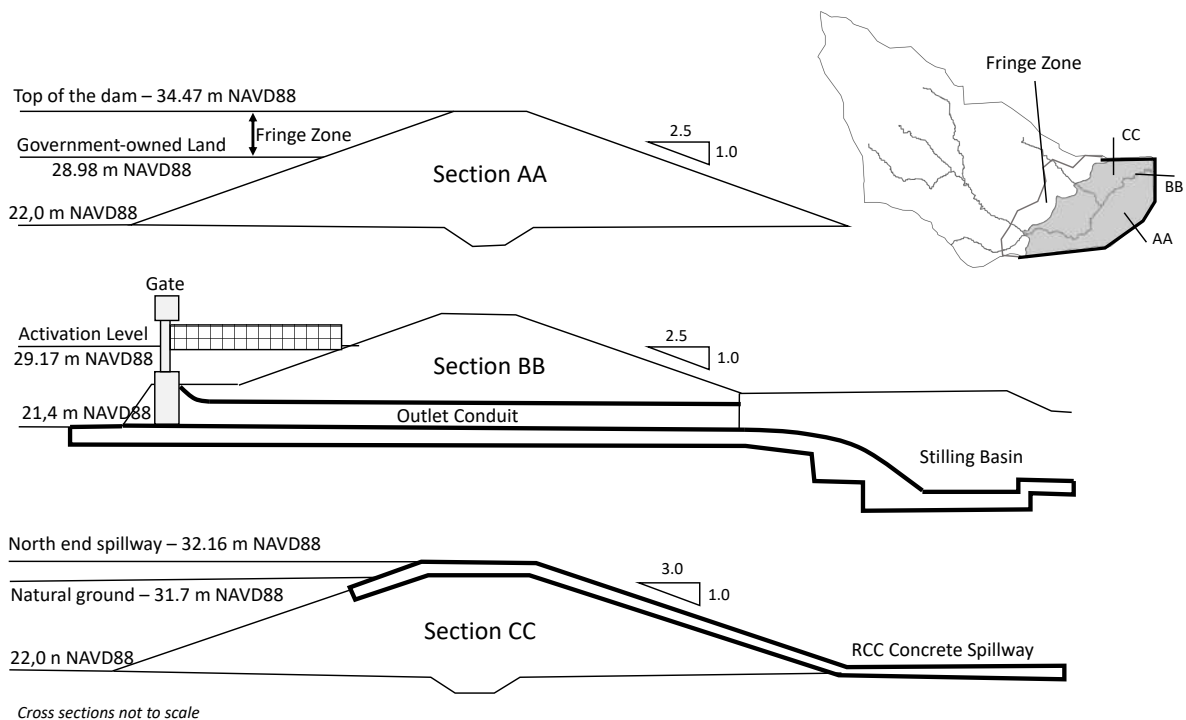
Representative cross sections Barker Dam: (AA) Barker Dam typical cross section, (BB) Barker Dam outlets cross section, (CC) Barker Dam spillway cross section
